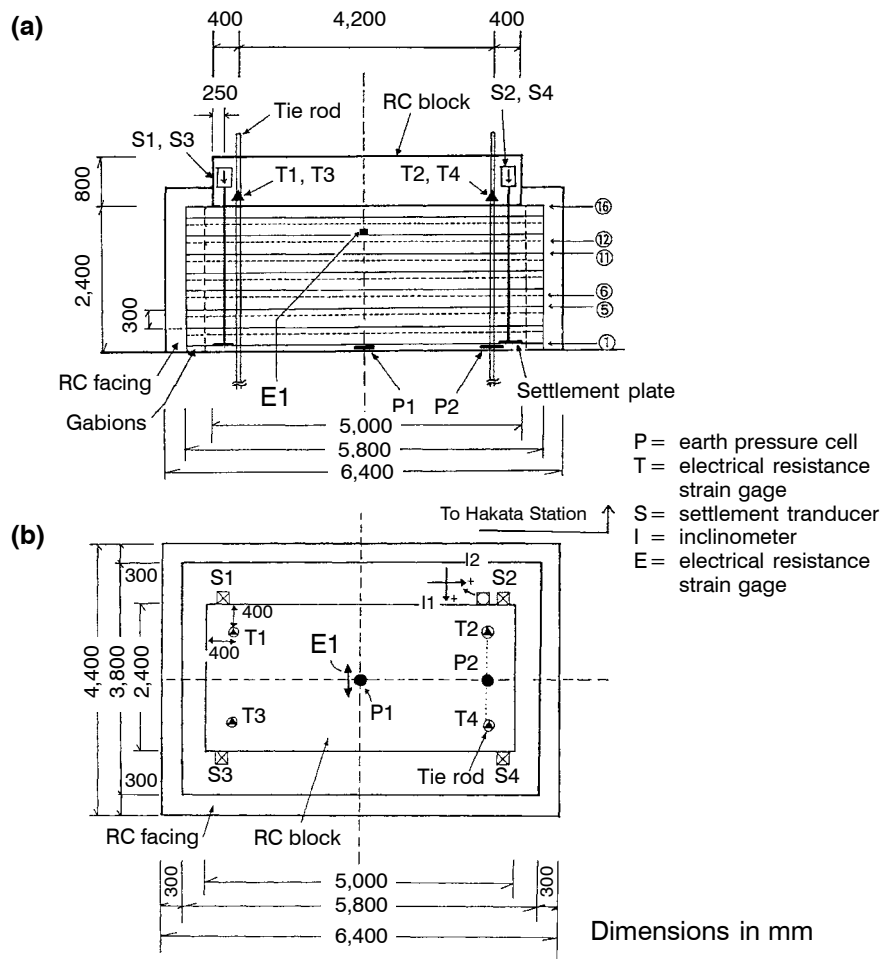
PLPS GRS instrumented bridge pier on the Sasa-guri Line (Location 57, Figure 3), Fukuoka, Kyushu: (a) typical cross section ; (b) plan view (Uchimura et al. 1996, 1997; Tatsuoka and Uchimura 1997b).
